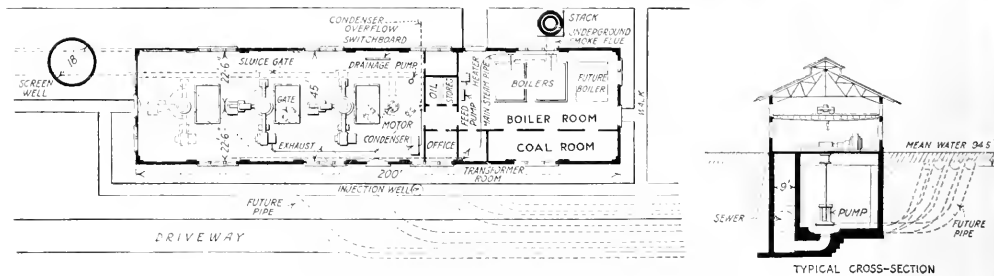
PLAN AND VERTICAL SECTION THROUGH STATION
